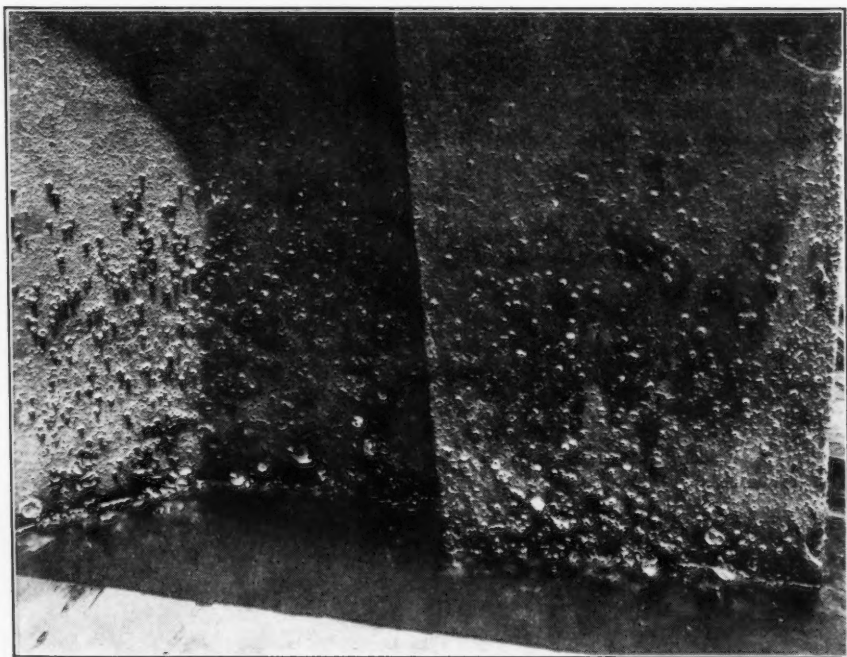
DETAIL OF ABUTMENT OF EAST NEAPOLITAN BRIDGE IN NAPLES DISTRICT, LONG BEACH, CALIF., OFF ALAMITOS BAY, ERECTED IN 1913
